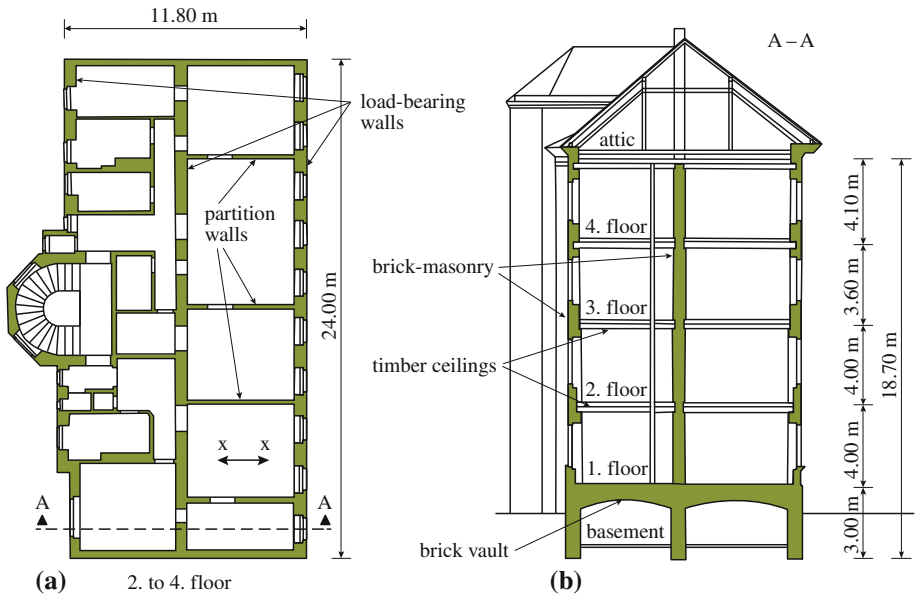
a Floor plan of the 2nd, 3rd floor and 4th floor, and b section of the object “Riglgasse 10”
